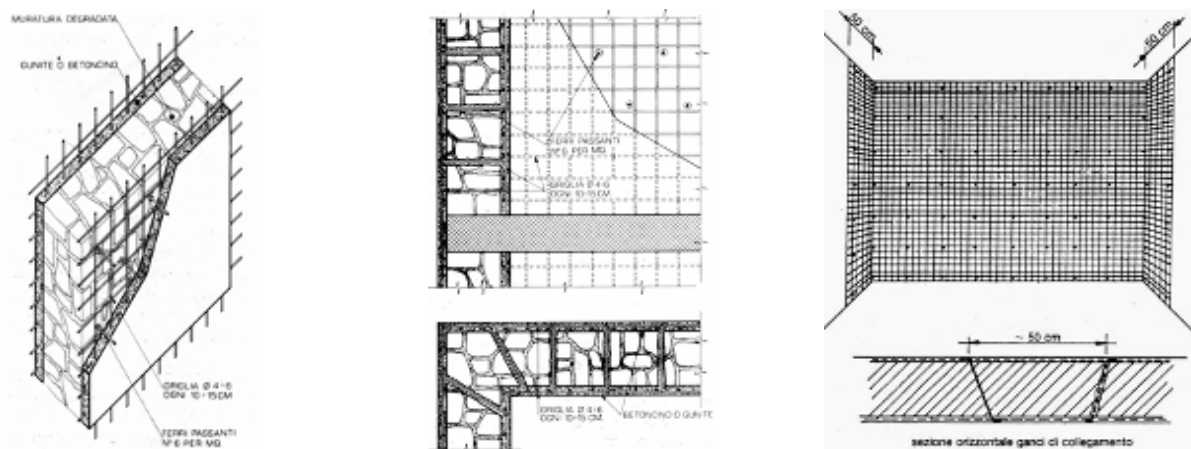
Layout of the R.C. jacketing reinforcing.
